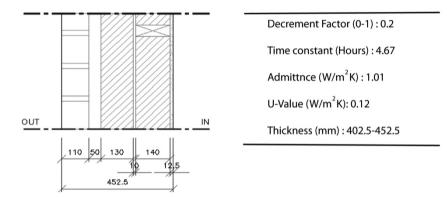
From Out to in: 110mm Brick Outer Leaf, 50mm Air Gap, 130mm Rockwool, 10 mm Plywood, 140mm Rockwool, 12.5mm Plasterboard
